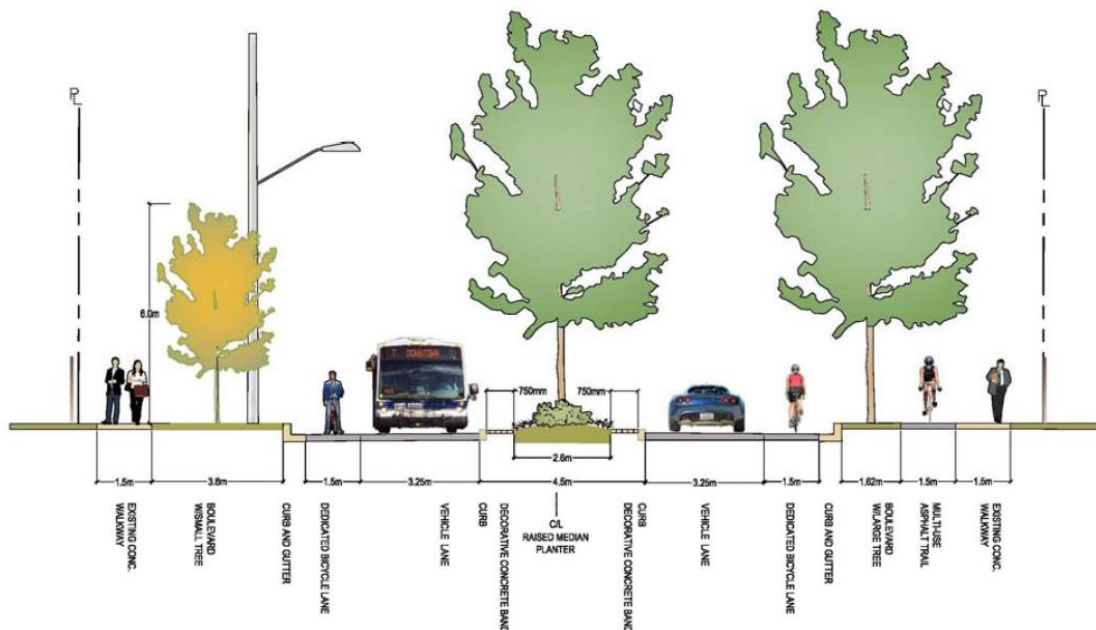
Road Diet Vision for Davenport Road, Lexington Road to Old Abbey
